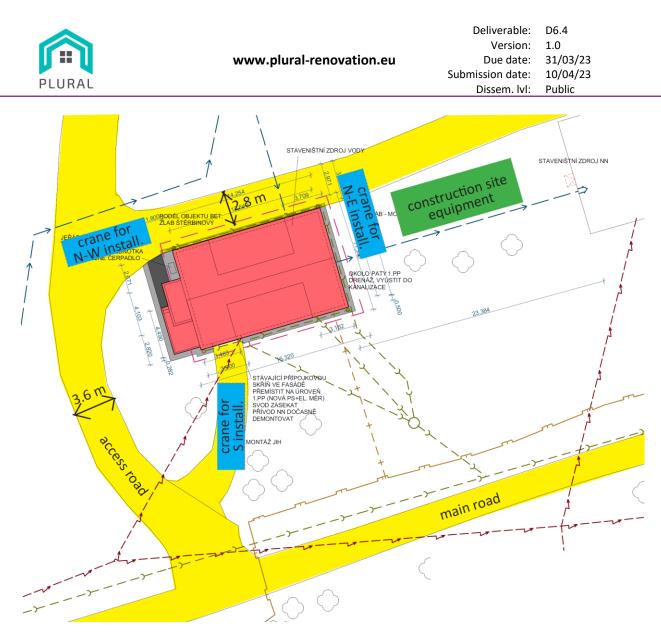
KASAVA DEMO BUILDING CONSTRUCTION SITE PLAN
